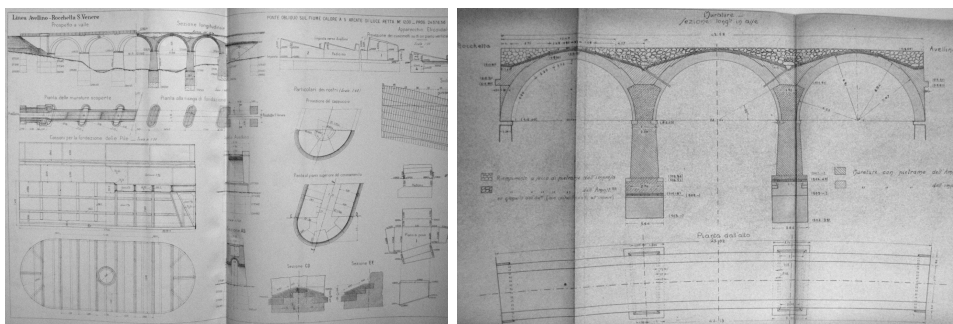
(left): The oblique bridge crossing Calore river, plan 1898.
